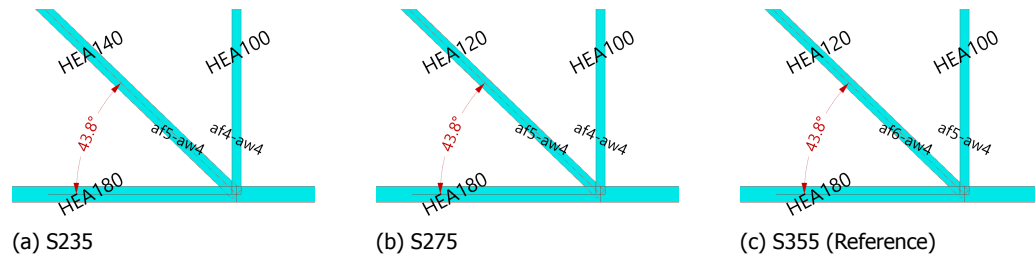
Flange-weld size (af) and Web-weld size (aw) per steel-grade
